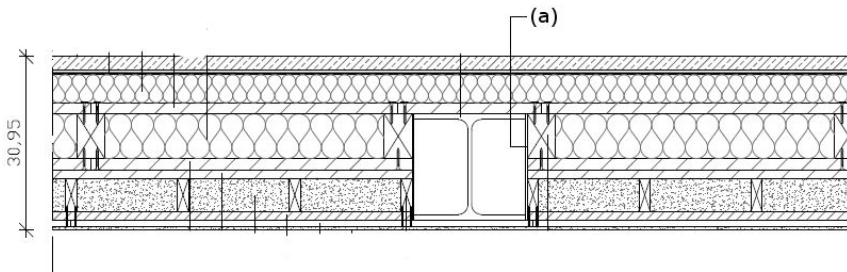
Particular of the coupling between vertical wall and steel pillar.
